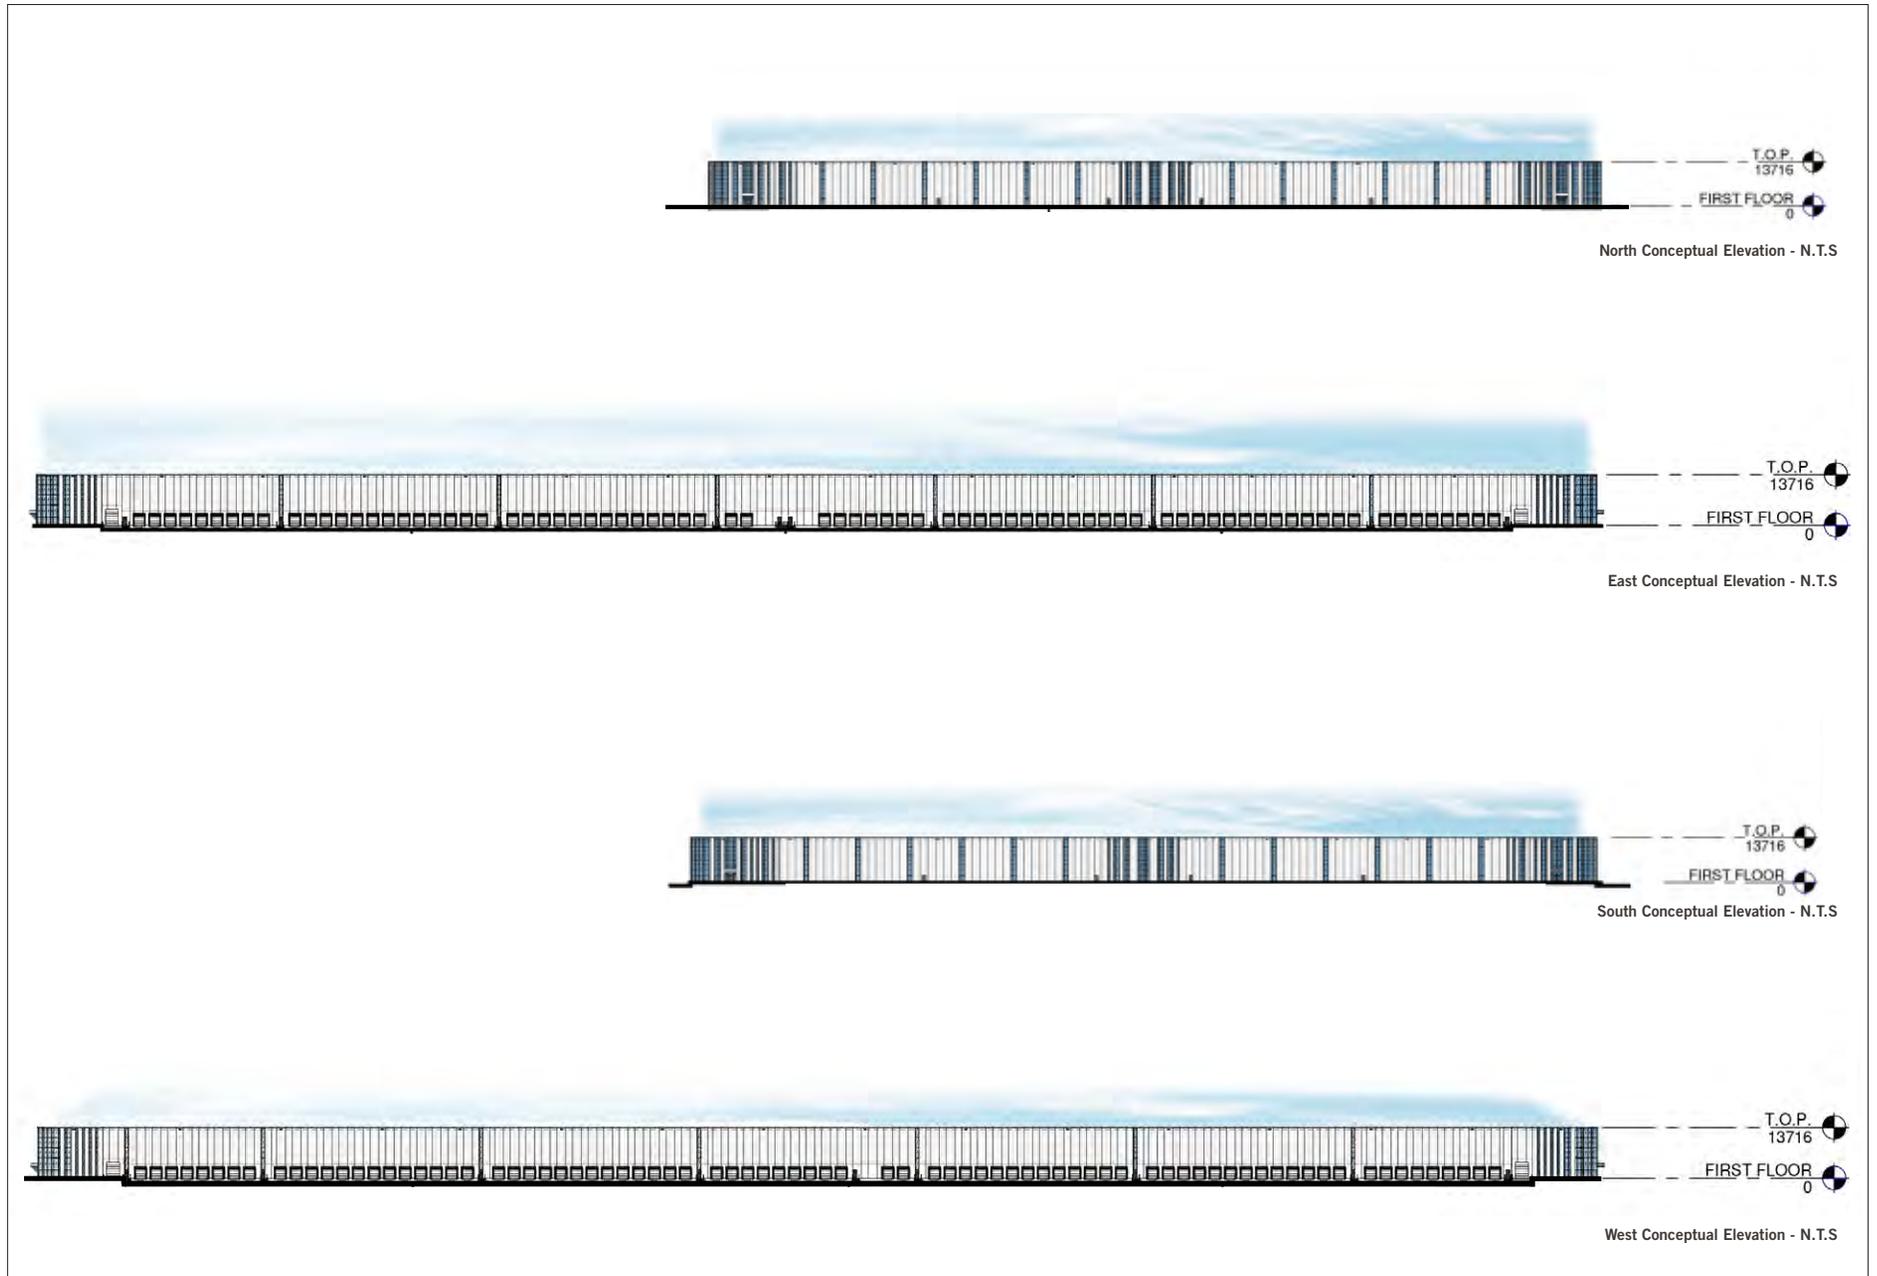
Proposed Building Conceptual Elevations – Building 1, prepared by Ware Malcomb
